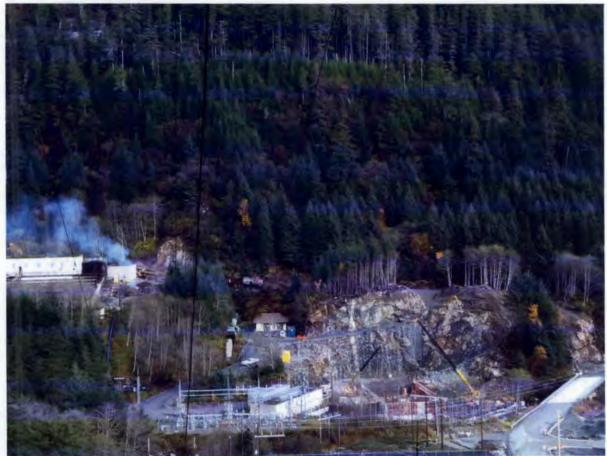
Lower Project Site, Removal of the rock knob at the powerhouse access road continues.
